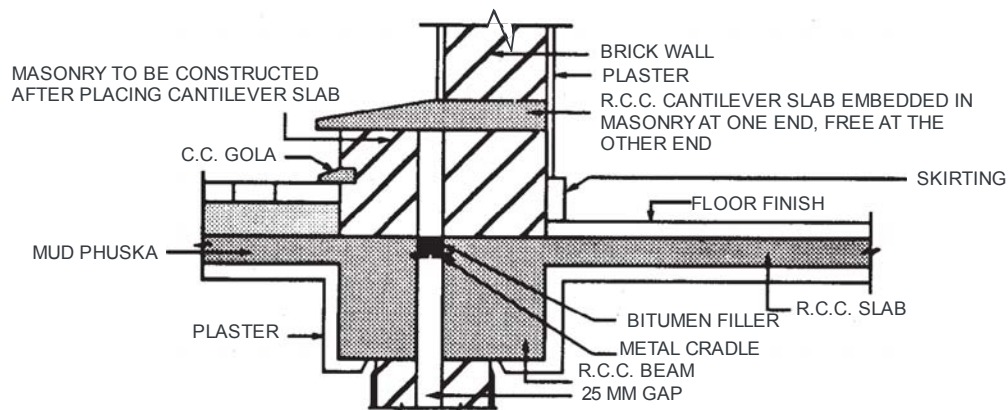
Typical Details of Expansion Joint at Roof & Floor Junction
